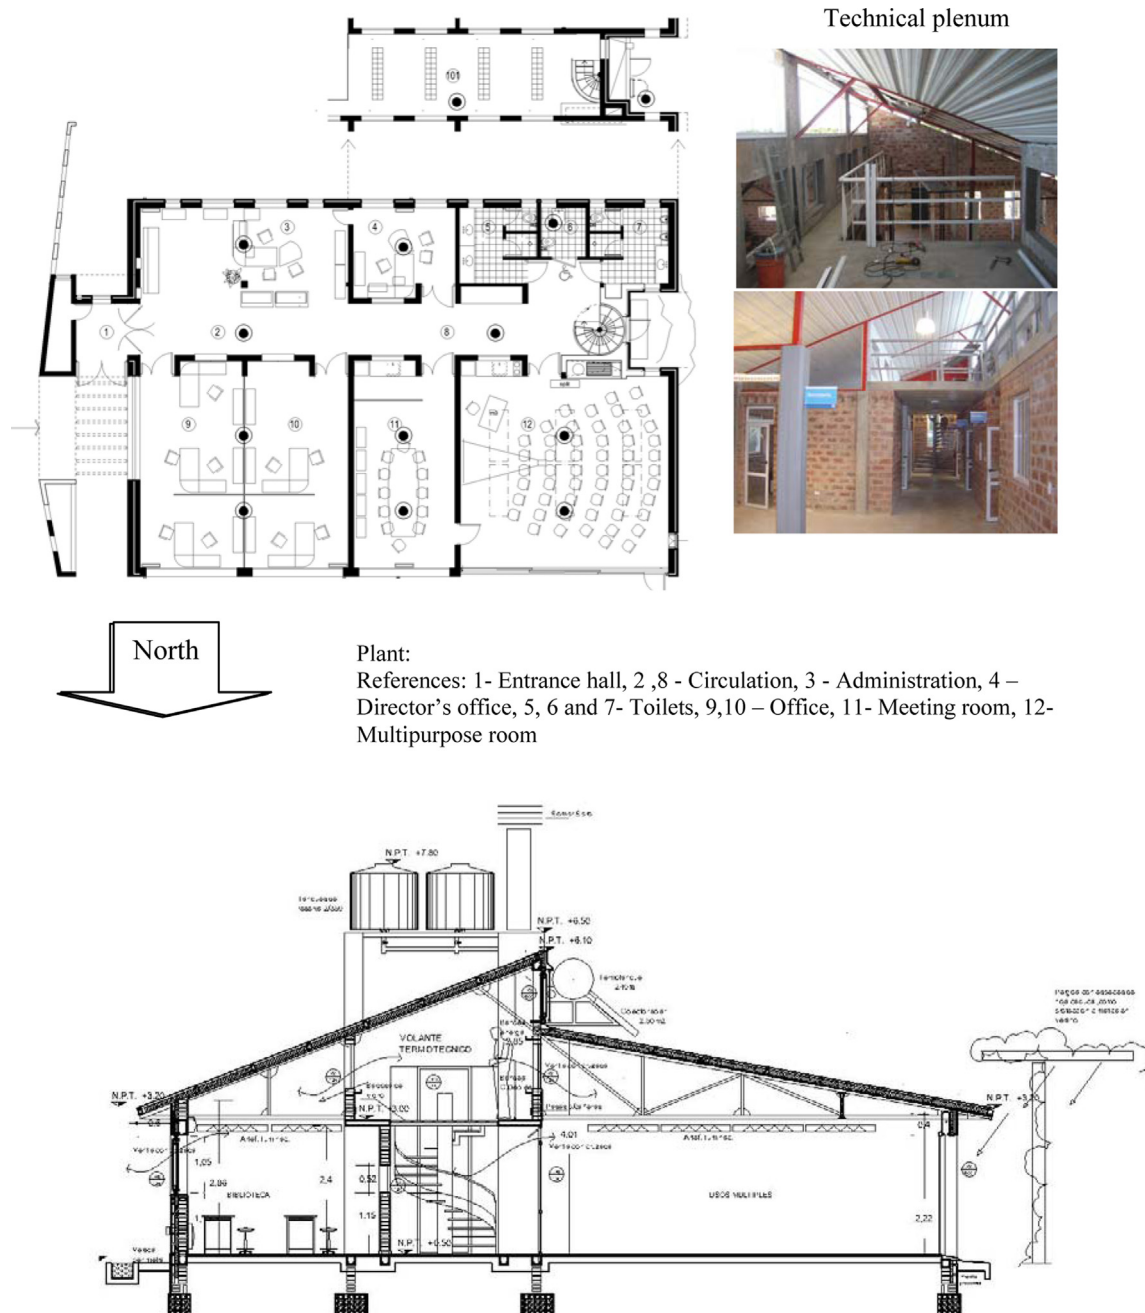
Building form and internal planning, cross-section and indoor view of the technical plenum.
